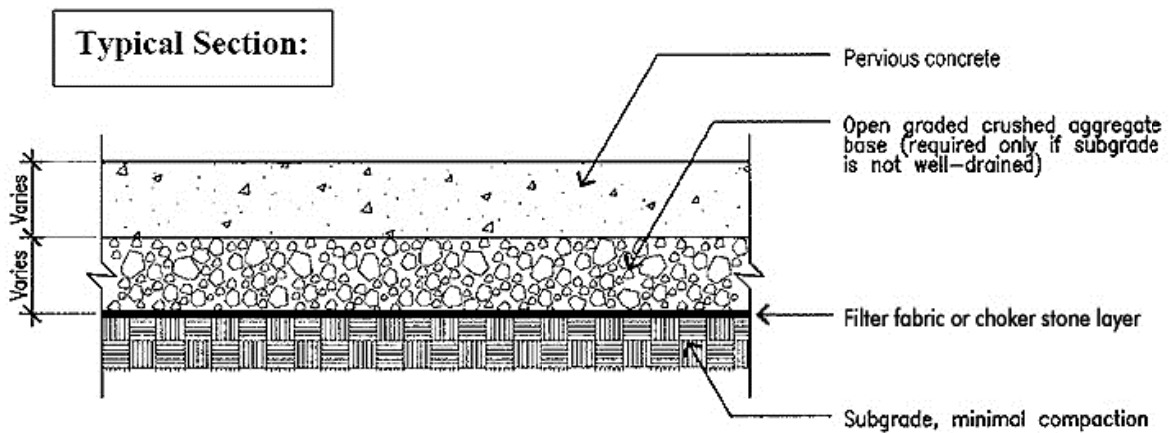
Typical Detail of Pervious Concrete (Source: Portland, 2003)
